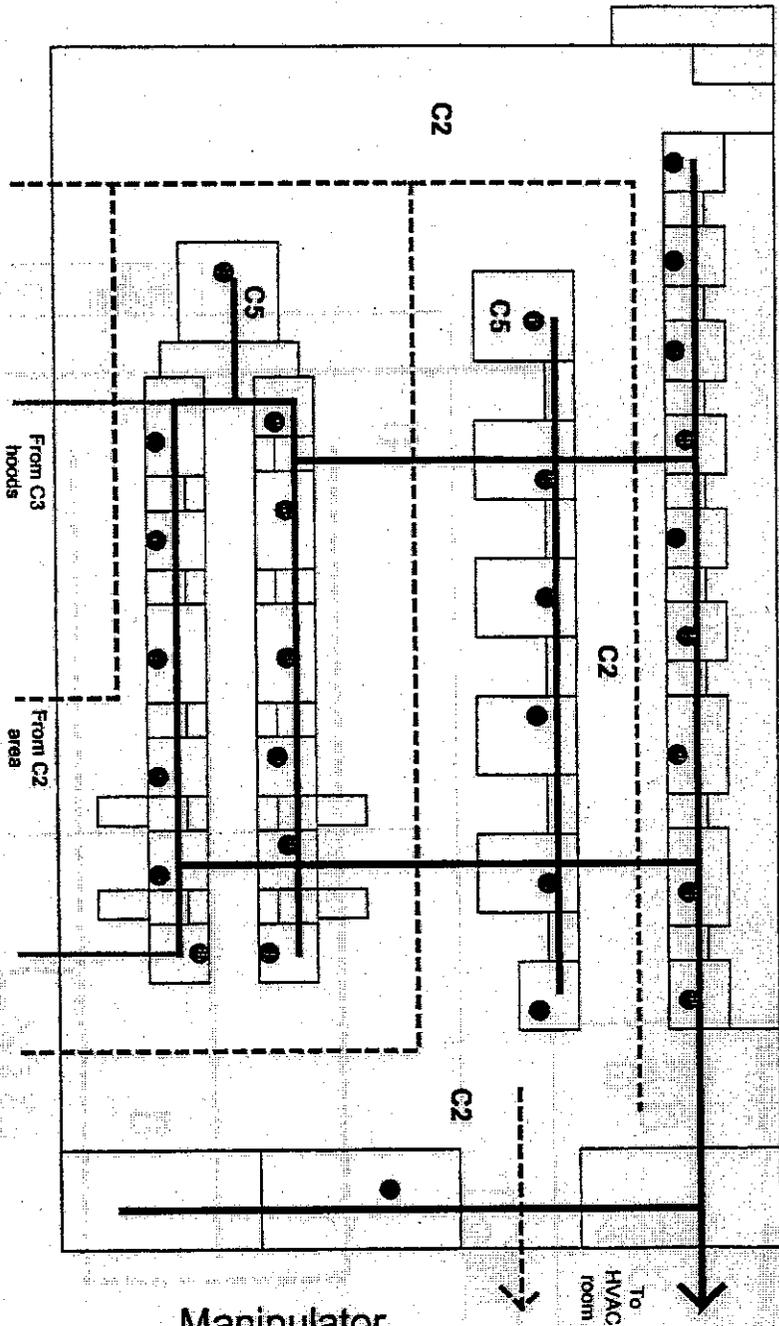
A-115 Analytical Laboratory Second Floor Ventilation
